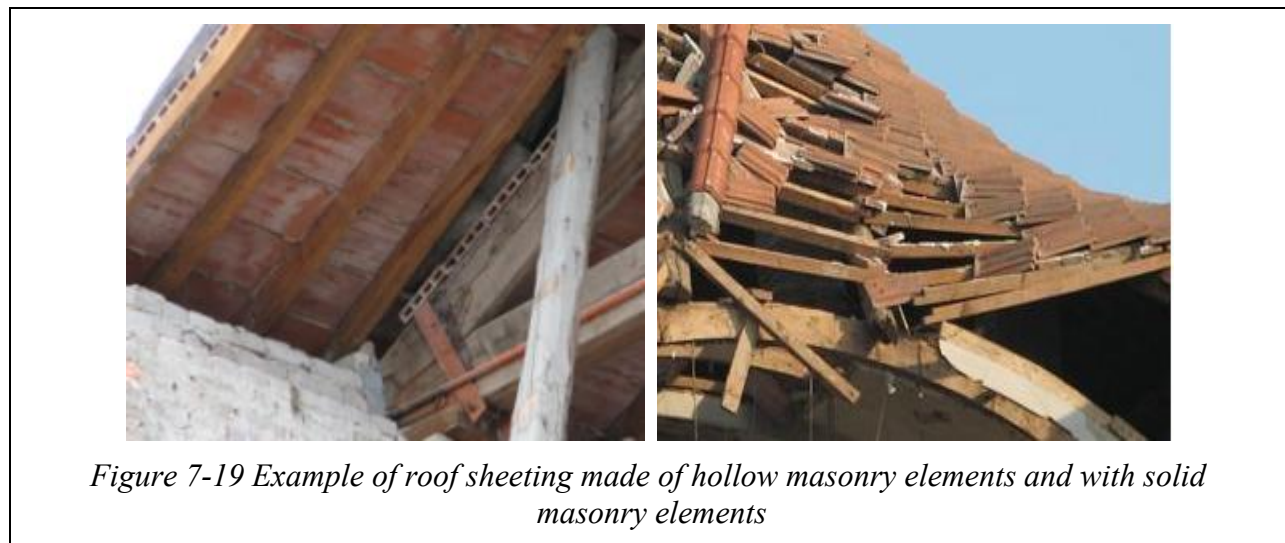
Example of roof sheeting made of hollow masonry elements and with solid masonry elements
